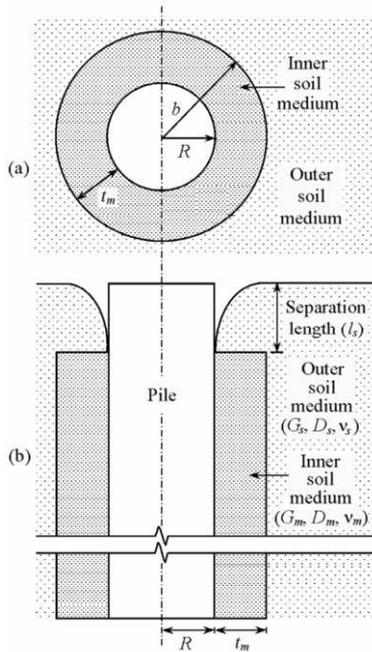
Schematic presentation of nonlinear model (a) Section view (b) Plan view
